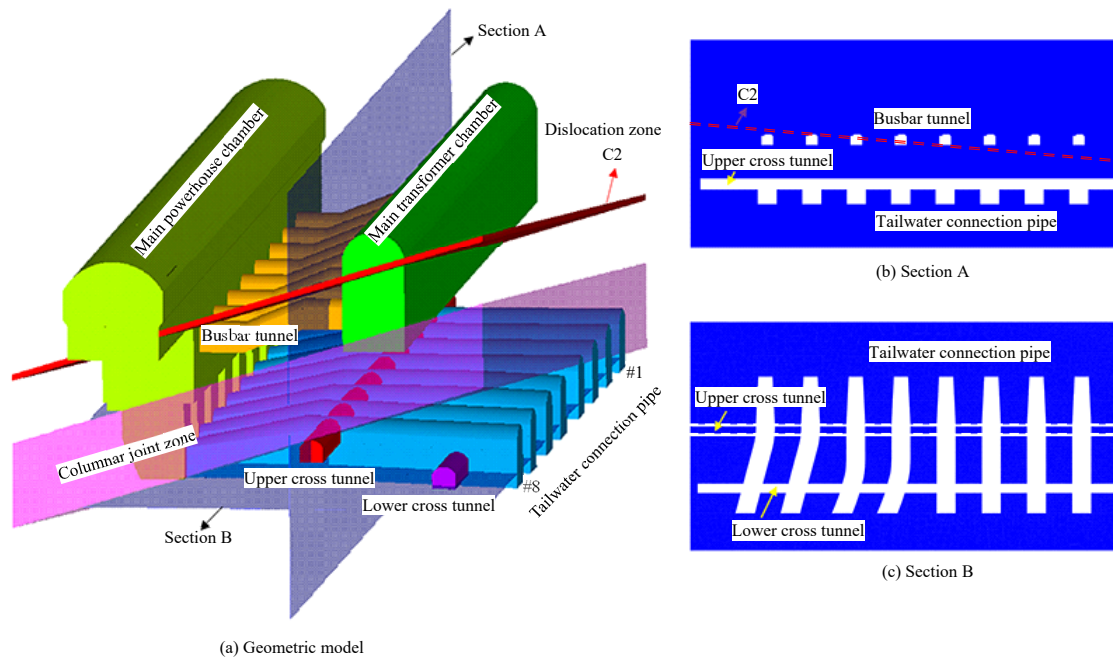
Geometric model of caverns in the left bank of tailwater connection pipe of Baihetan Hydropower station and its section
